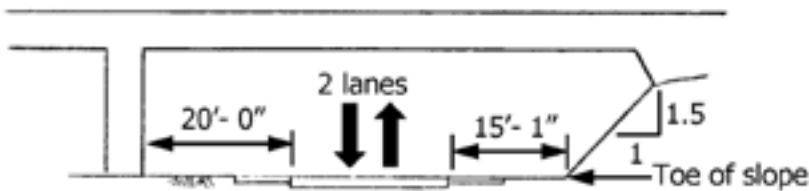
Bridge elevation view of horizontal clearances for a 2-lane highway feature with two-way traffic below the bridge.
